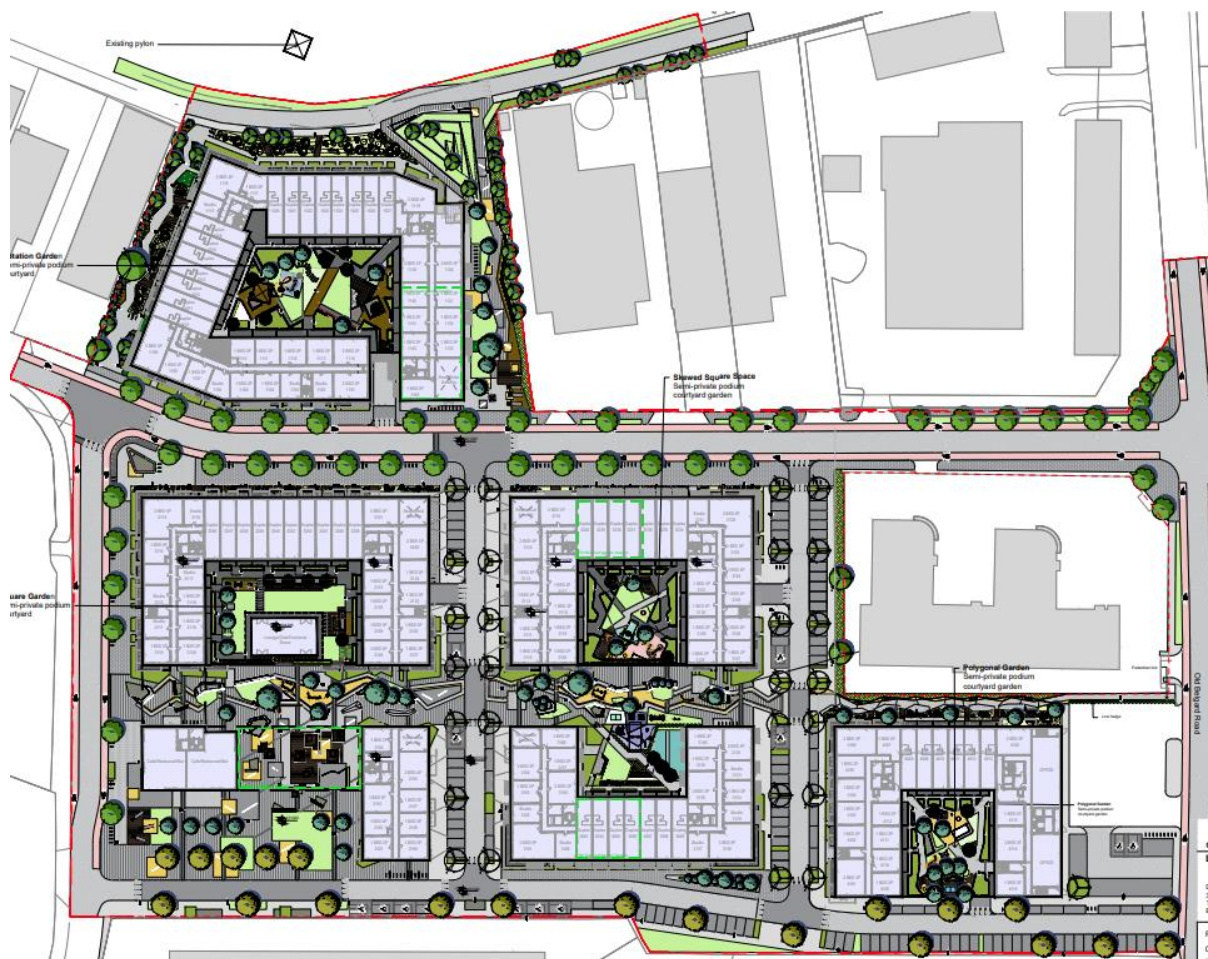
Ground and first floor landscape masterplan for the proposed development
